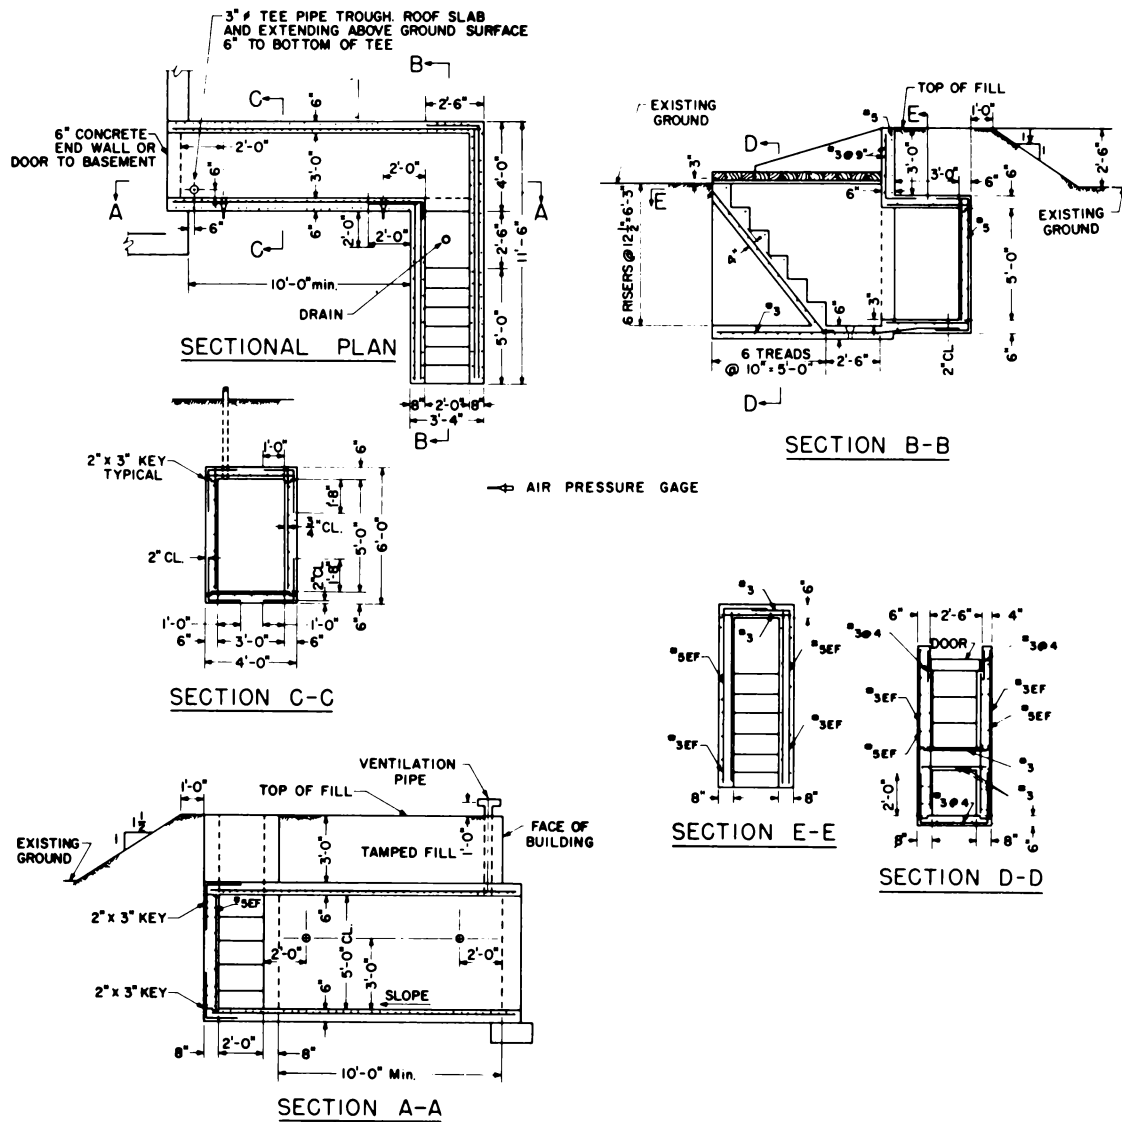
Details of basement-exit shelter, stations 4-34.1 b, 1-34.1 c, and 1-34.1 d.
